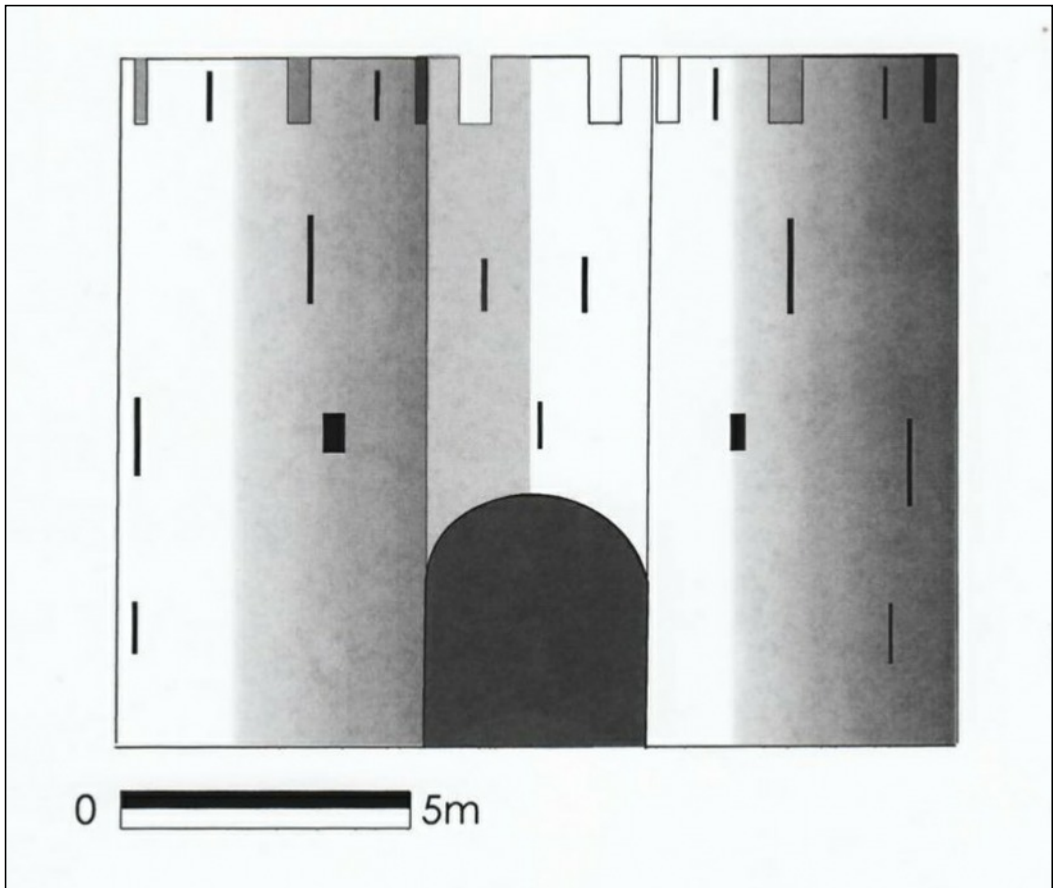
Reconstruction of the exterior of the barbican towers of St Laurence's Gate, Drogheda.
